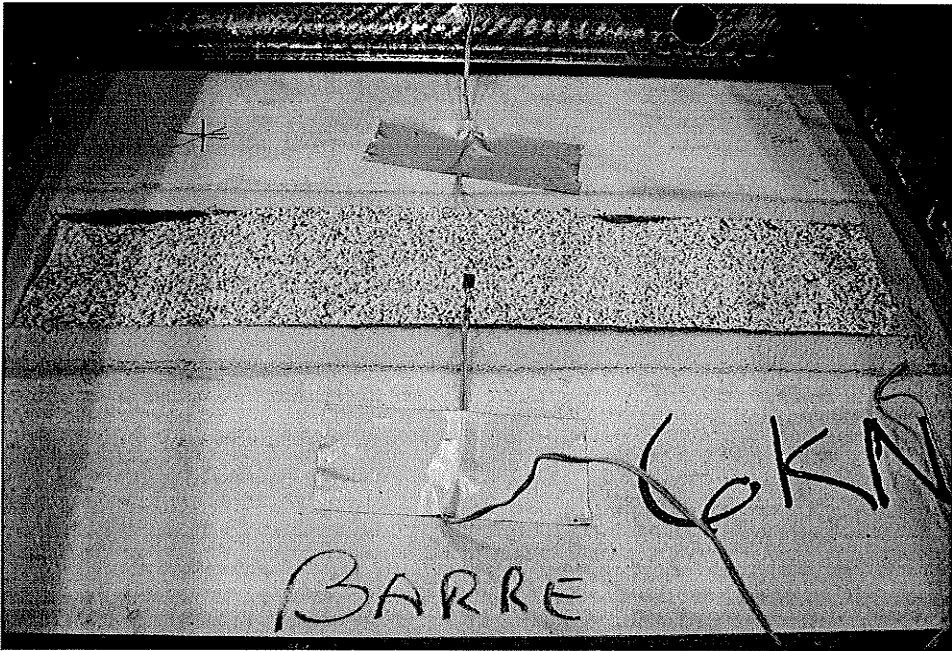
Failed pocket specimen – marker failed flush with support beam.
